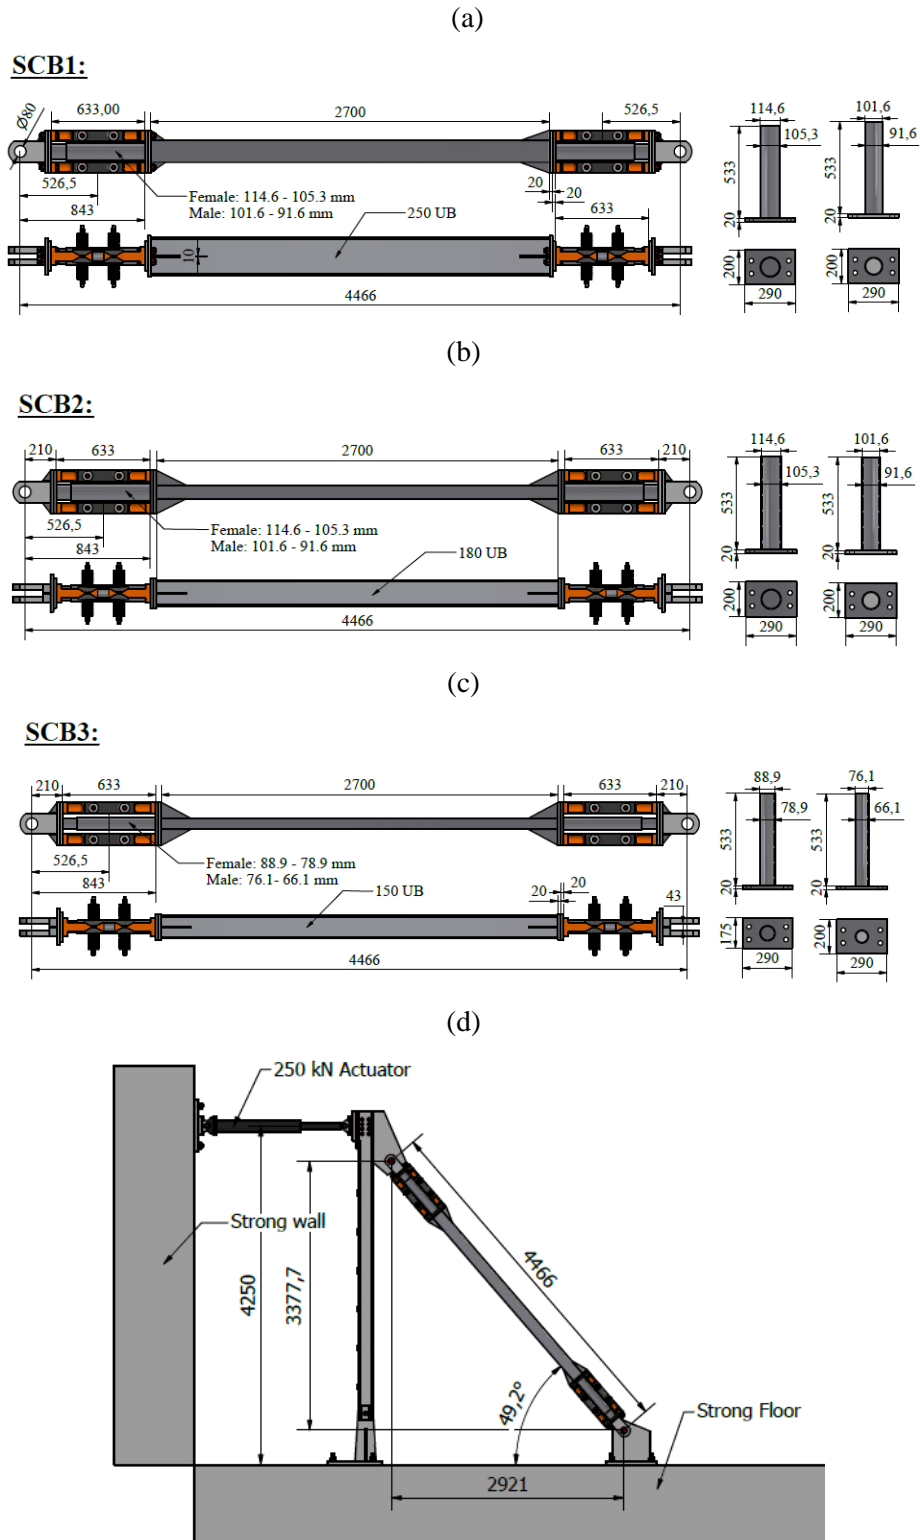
Specimens and set up dimensions: (a) SCB1, (b) SCB2, (c) SCB3, (d) Test set up dimensions
